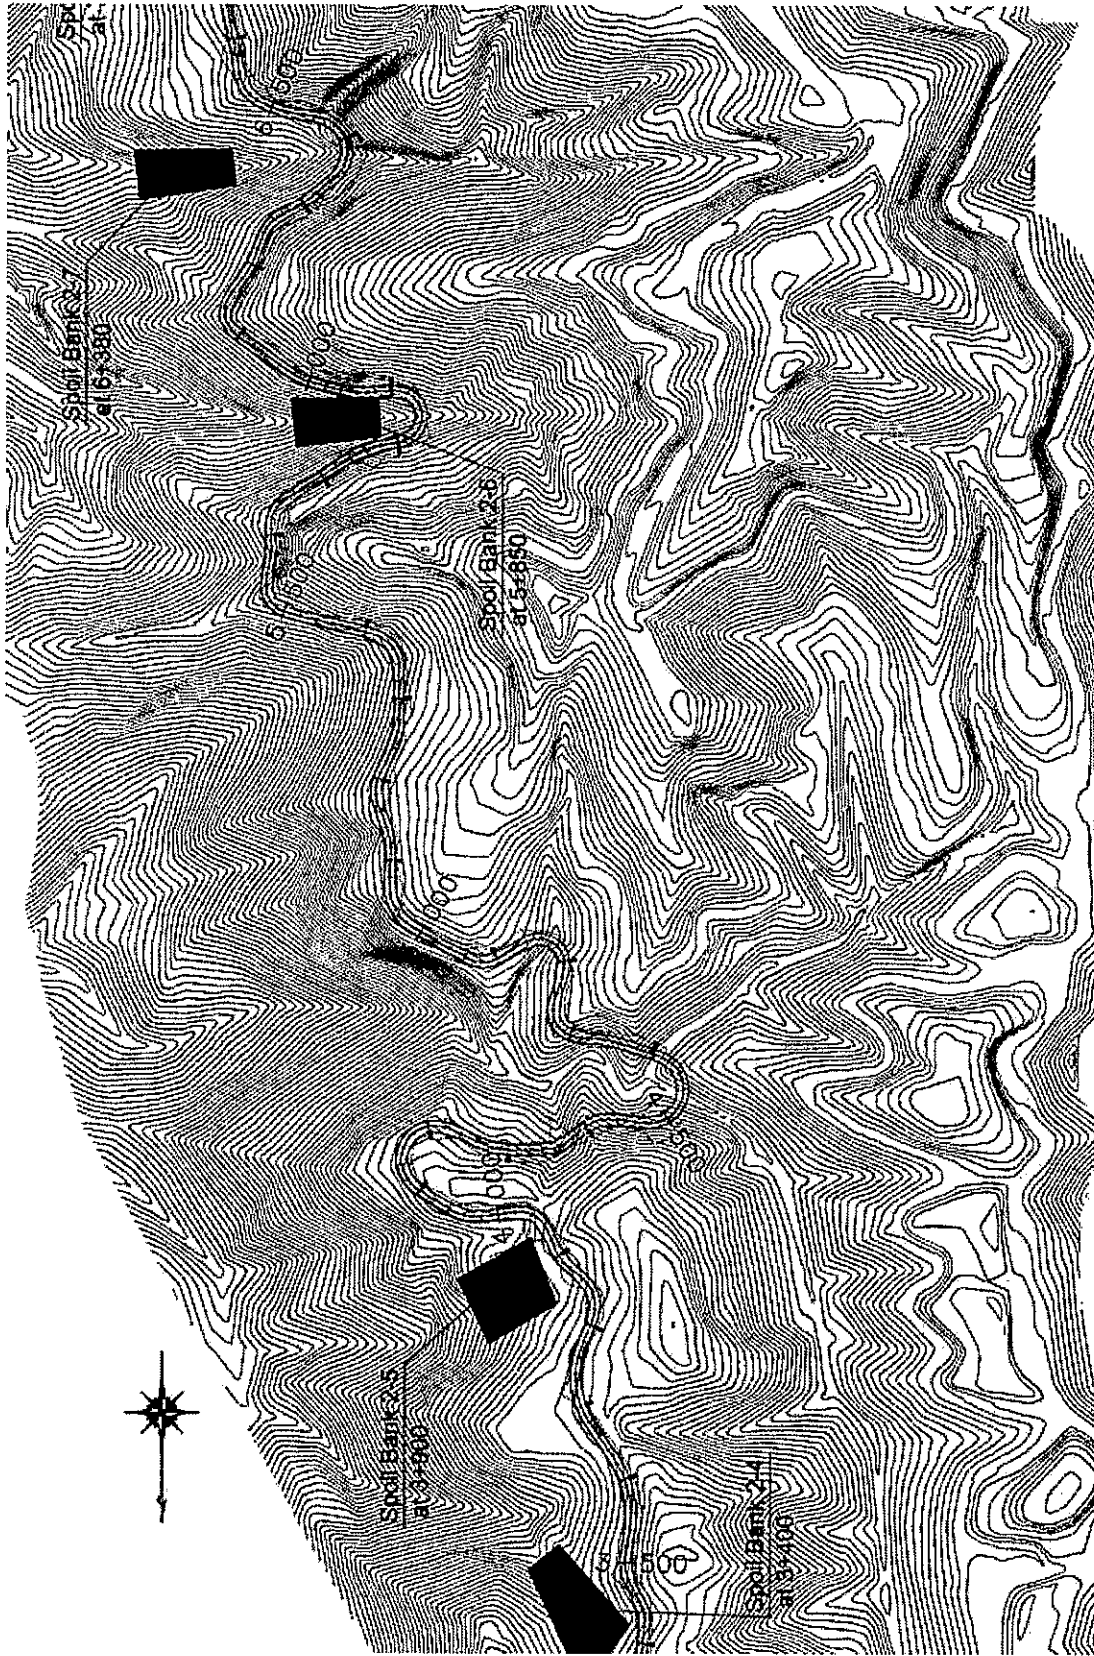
Plan for Locations of Spoil Bank (Serchhip Bypass) -2/4
